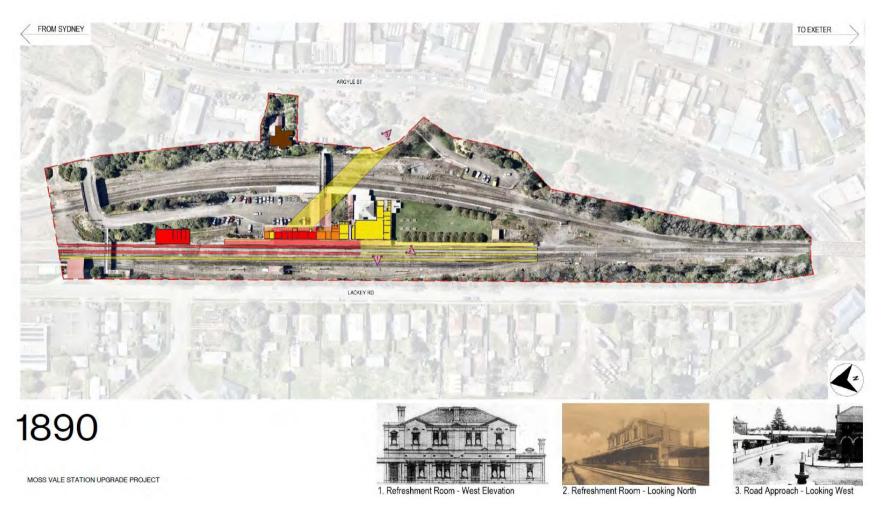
Addition of Refreshment Rooms in 1890. (Source: Architectus 2023)
